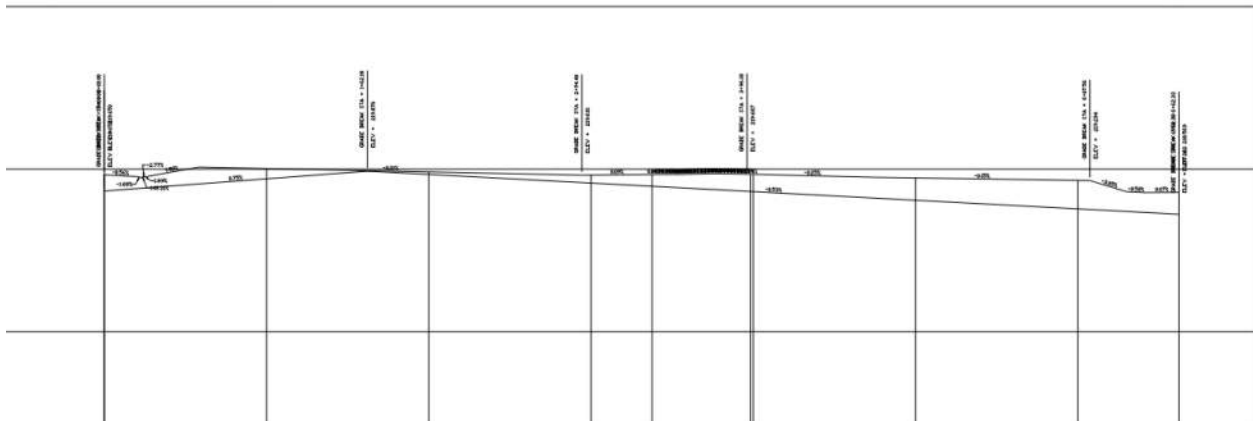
Bronco Road peak design with 0.75% to -0.53% slope vertical alignment.
